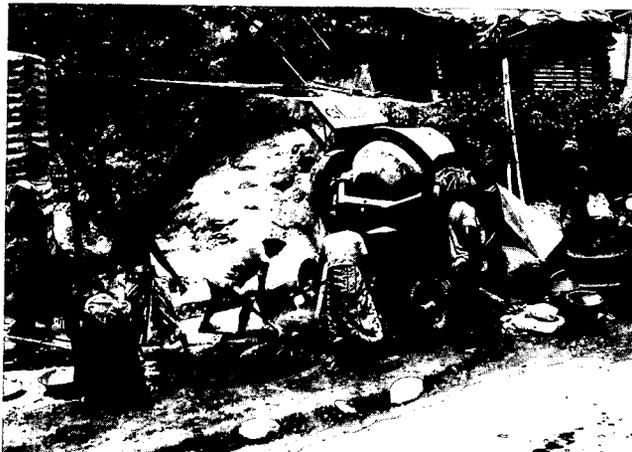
Cement stabilized gravel being mixed and loaded into headpans
